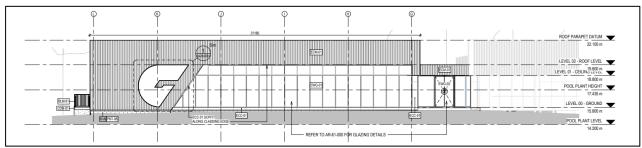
Northern elevation of proposed pool facility (*Source: External Elevations Plan, prepared by Populous, 15 December 2023*)
